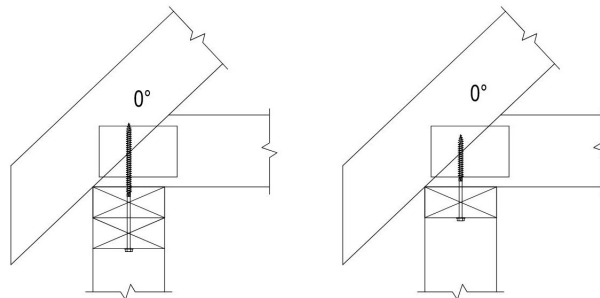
INSTALLATION OF FASTENERS IN TOP PLATE PERPENDICULAR TO TRUSS/RAFTER/JOIST APPLICATIONS
